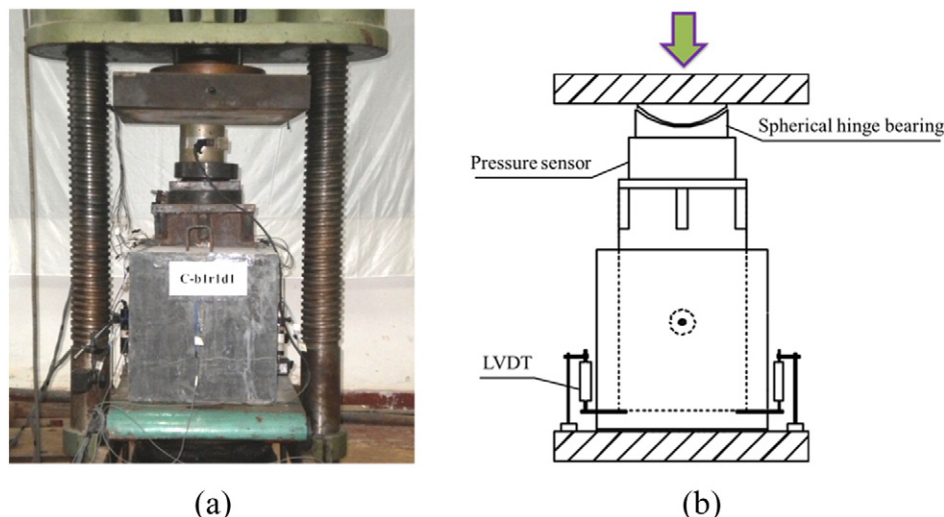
Push-out test setup: (a) General layout and equipment; (b) Layout of LVDTs.
